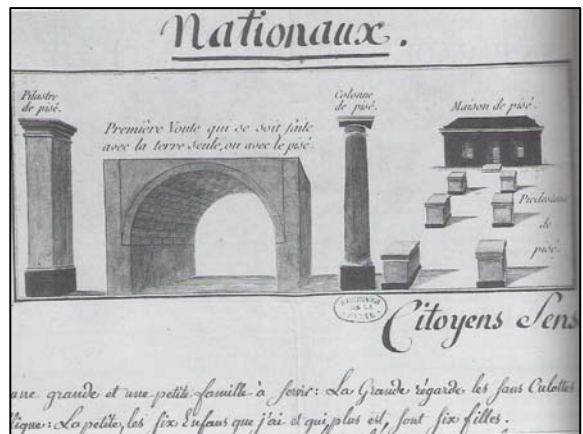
Design for columns and an arched vault built of pisé blocks. (Image: Louis Cellauro and Gilbert Richaud)
